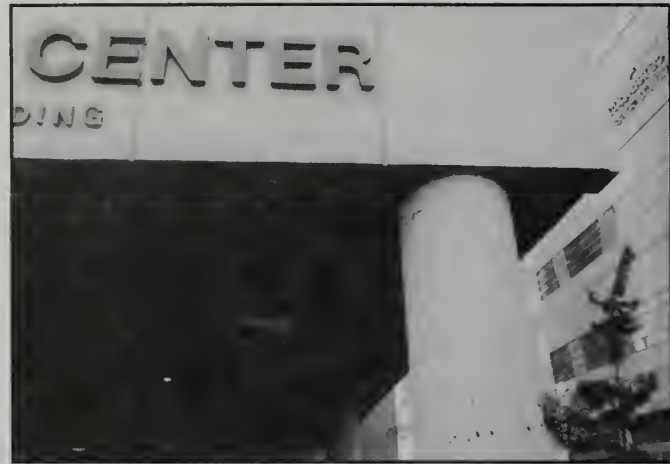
Cedars Sinai Medical Center, Schuman Building, showing cracking at the top of a column supporting the building. There was also shear wall cracking and broken windows in this building.
